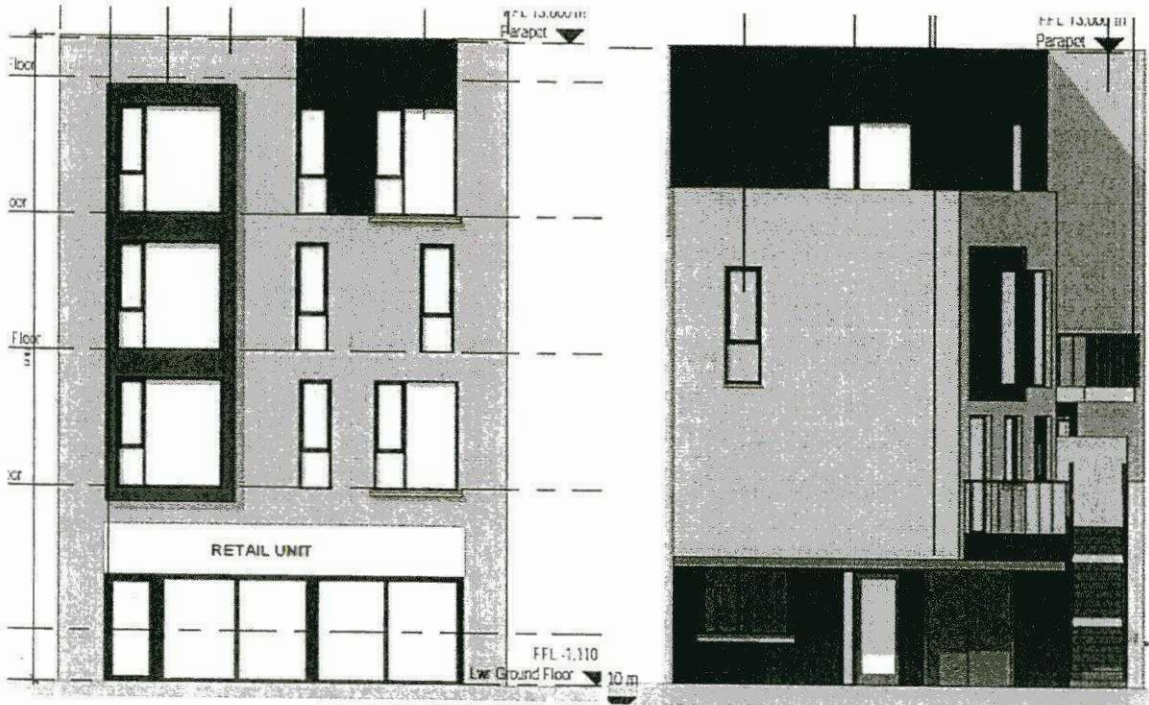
Front elevation (left) and rear elevation (right) of proposed development.
